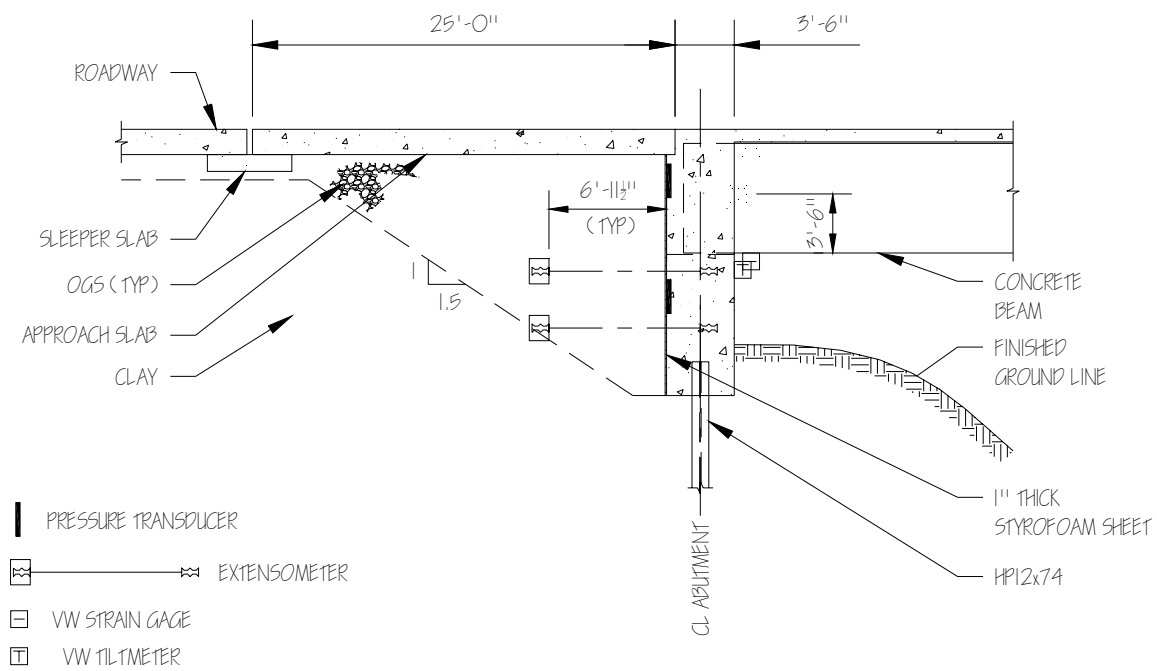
Structure 211 Cross-Section Through Abutment 2 (Section A-A)
